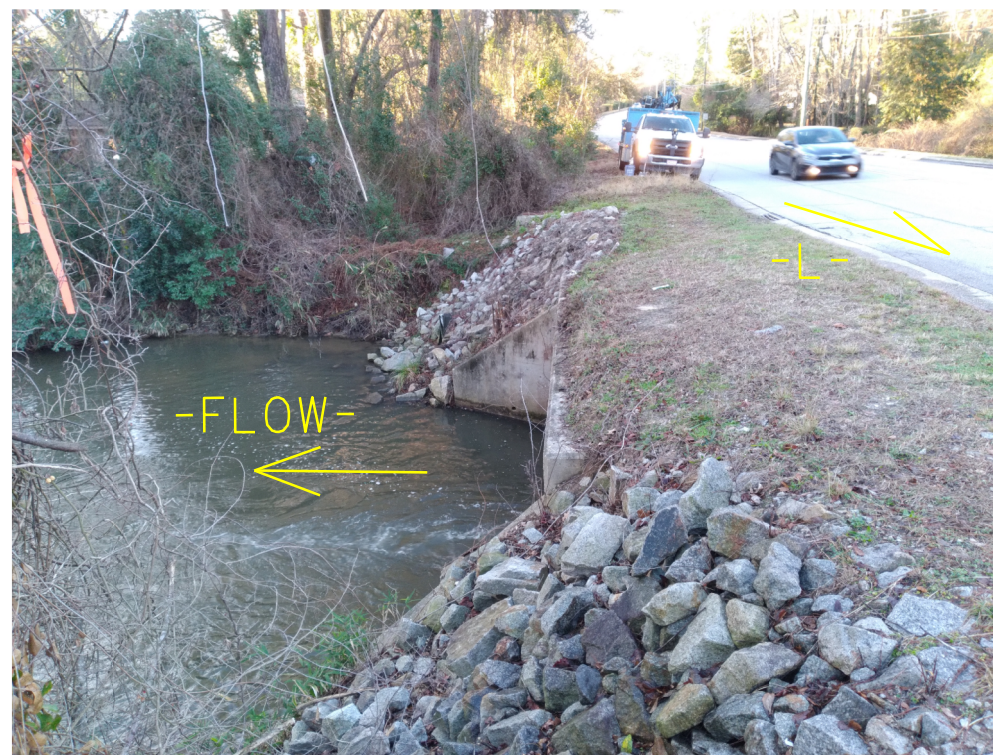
END BENT 2 OF EXISTING STRUCTURE NO. 250242 LOOKING SOUTHWEST (DOWNSTATION)
